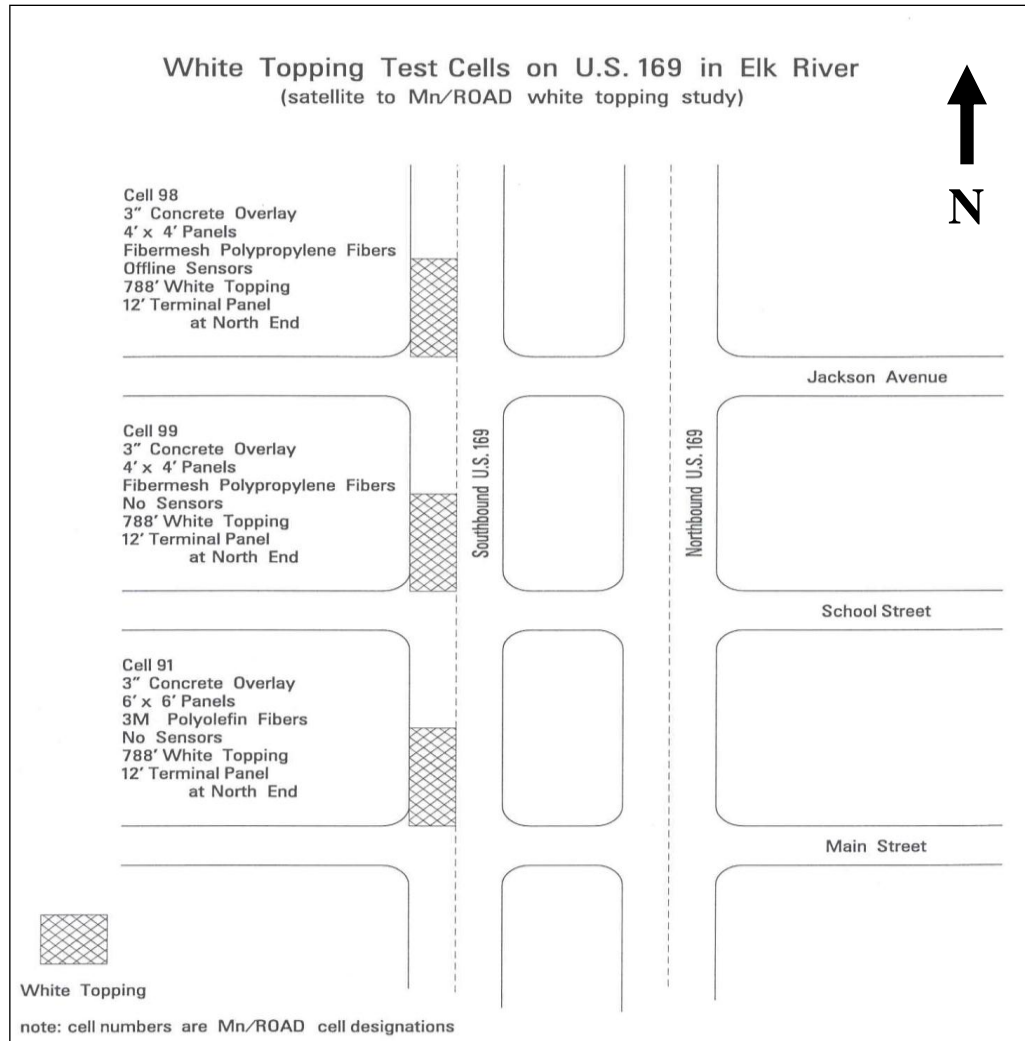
Layout of the UTW sections at the intersections of US-169.
